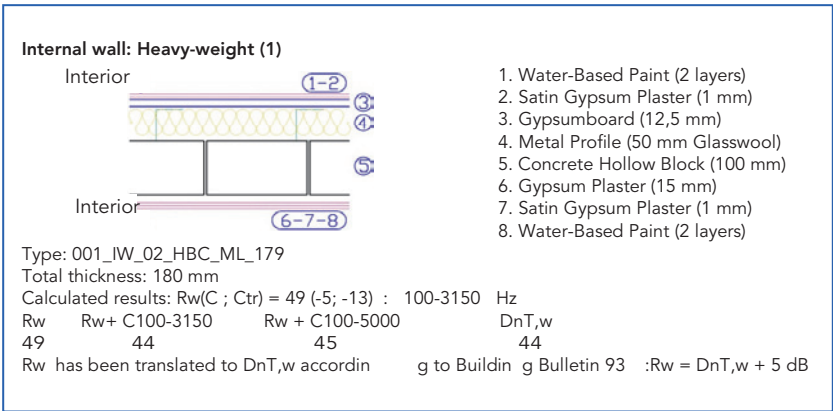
Heavy-weight wall. Construction details and sound insulation data.
